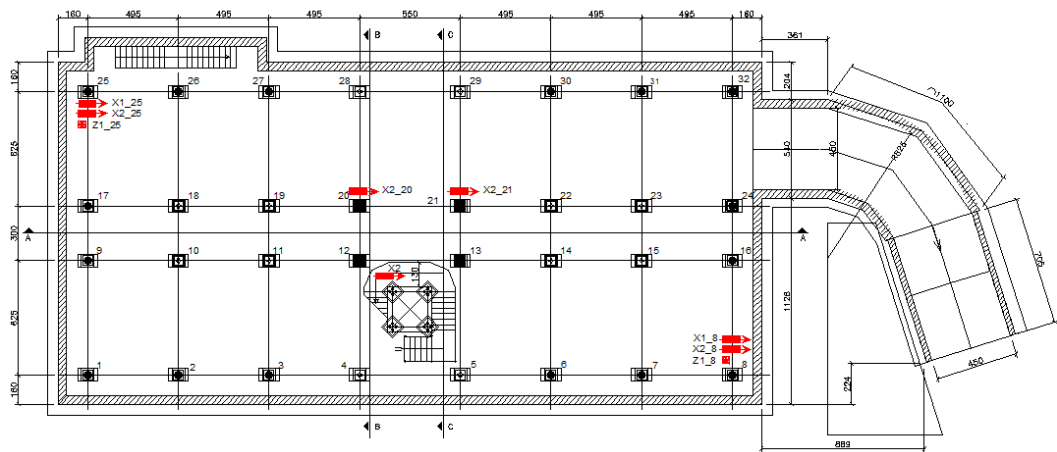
Transducers position along the rubber bearings 25 and 8, the sliding bearing 20, 21 and the sliding bearing of elevator shaft.
